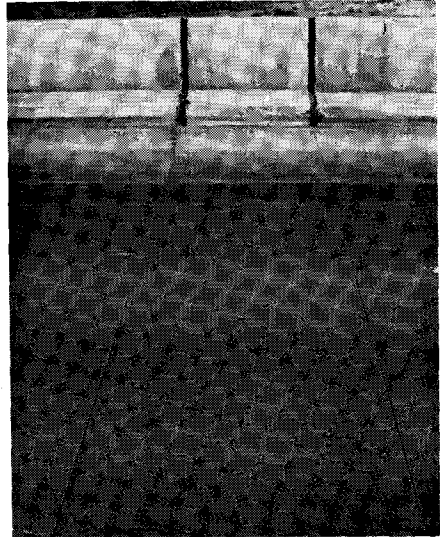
Narrow Sawed Joints in Pavement over Piers, Nuns' Island Bridge
